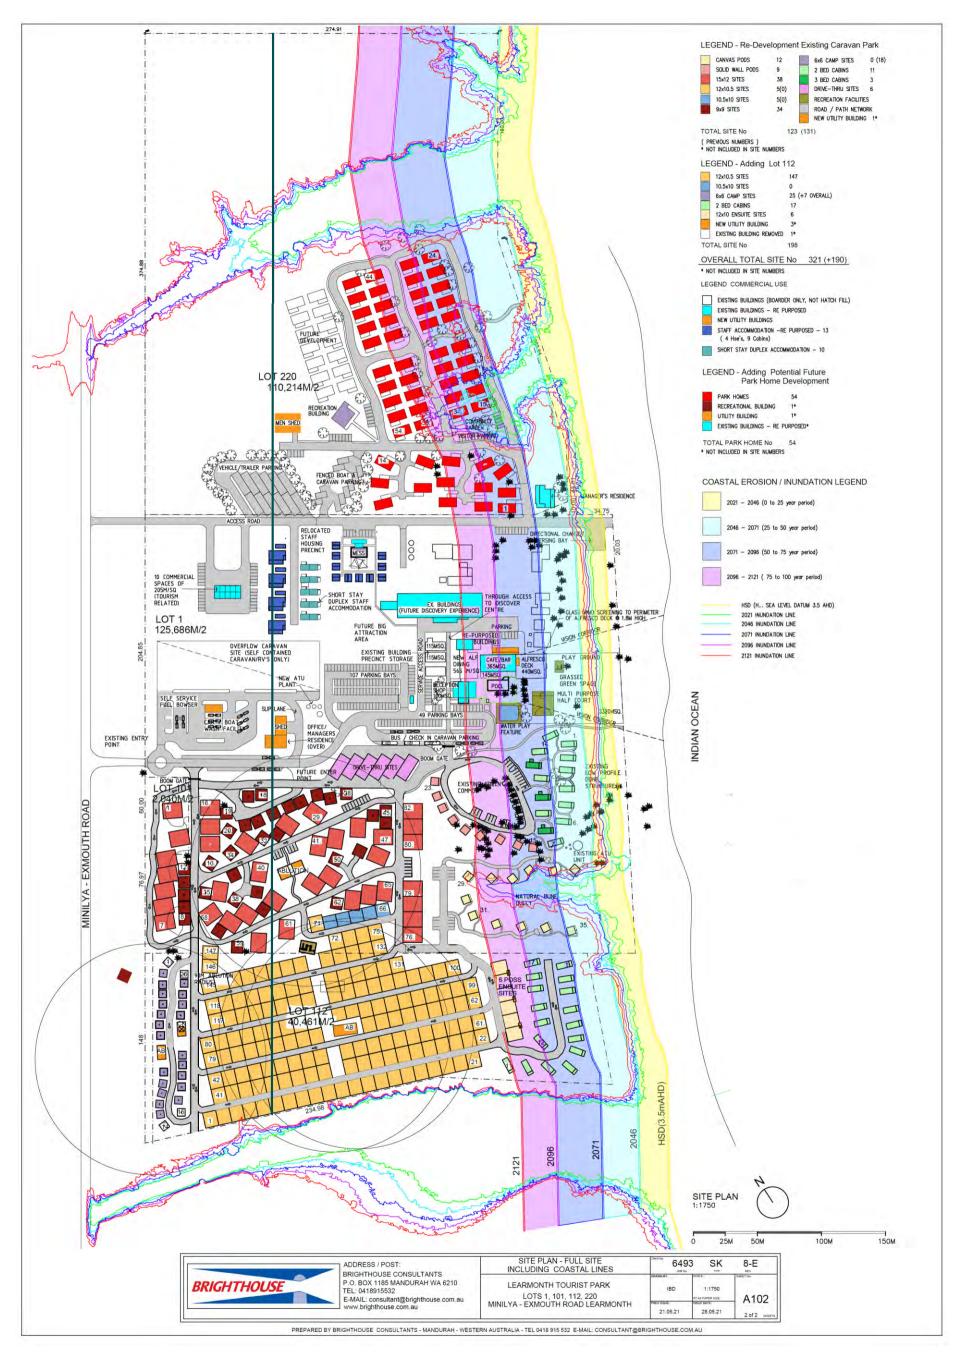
Kailis Properties Concept Development Plan (source Brighthouse 2021)
